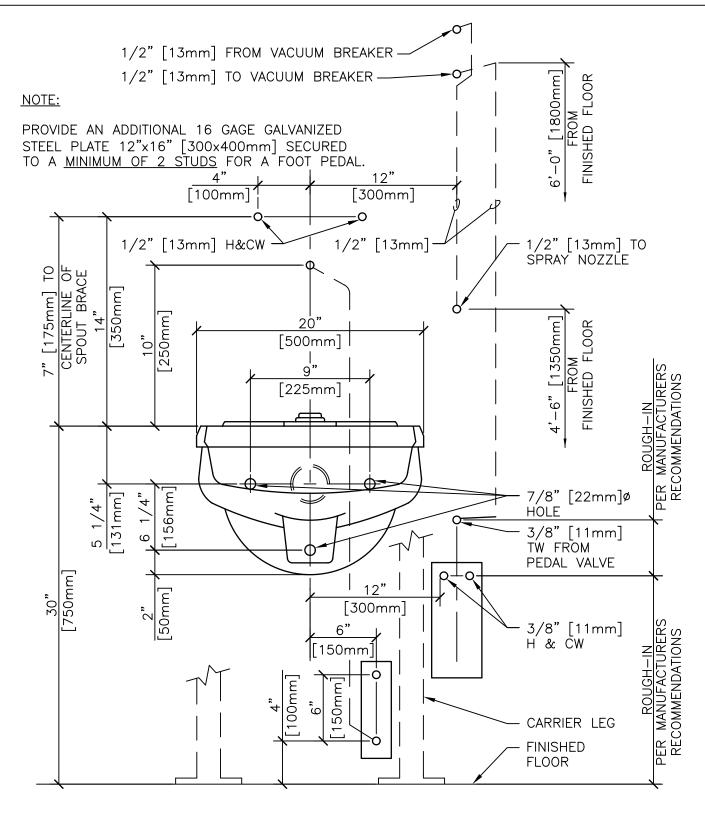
DETAIL TITLE / TYPICAL WHEELCHAIR LAVATORY DETAIL
